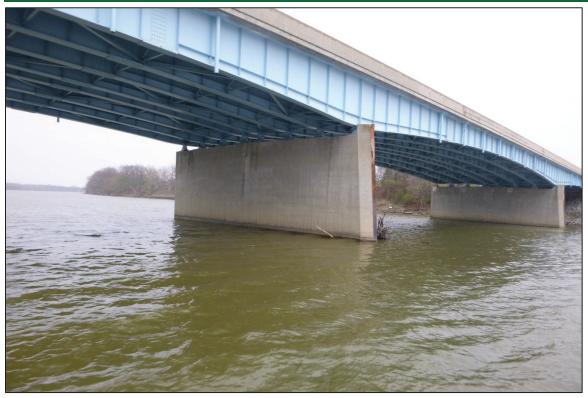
View of the North Face of Pier 3, Looking Southeast.
